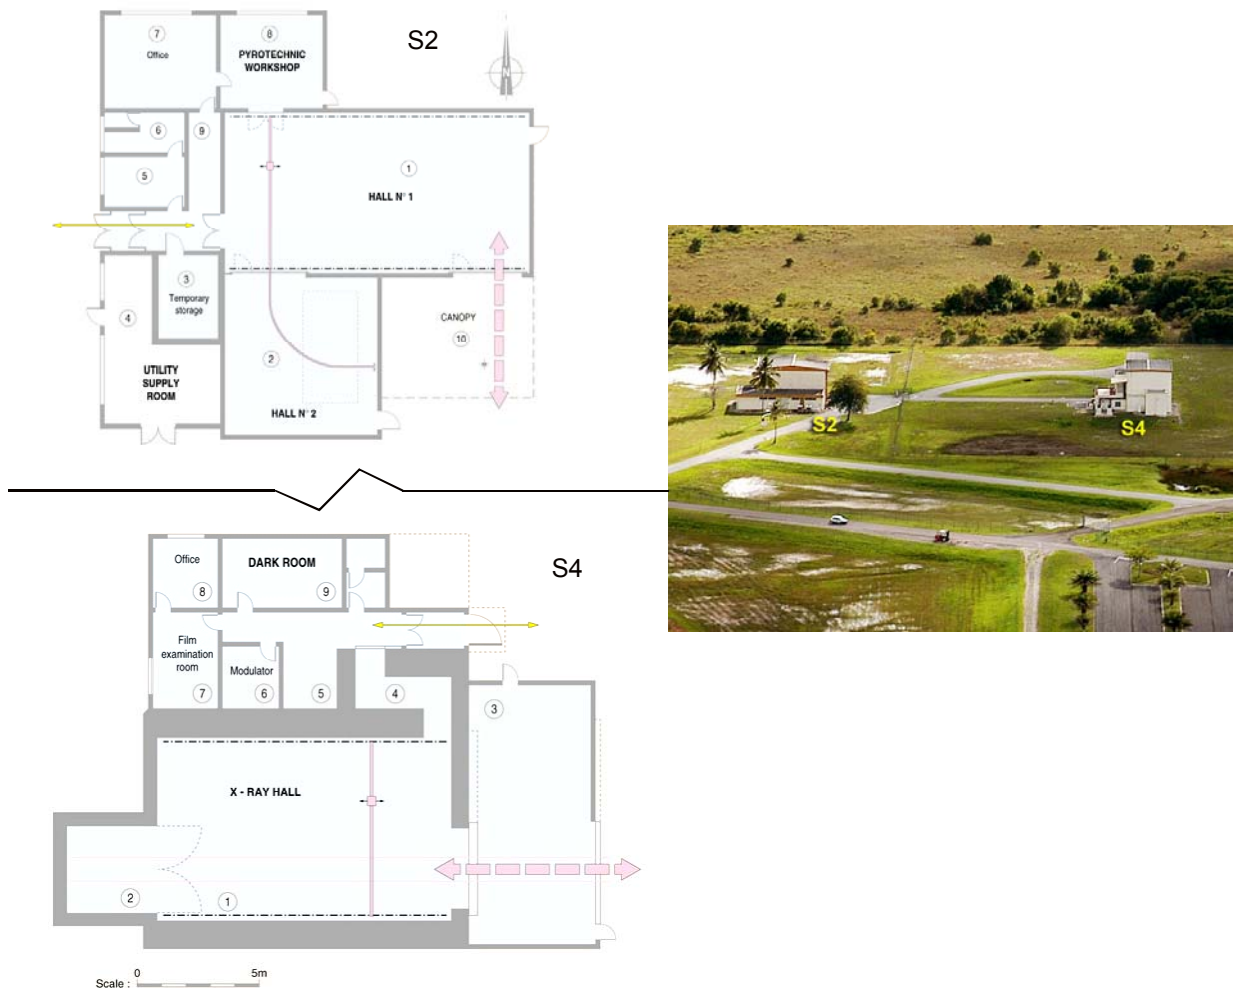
a – Layout of Hazardous Processing Facility at S2-S4 area
